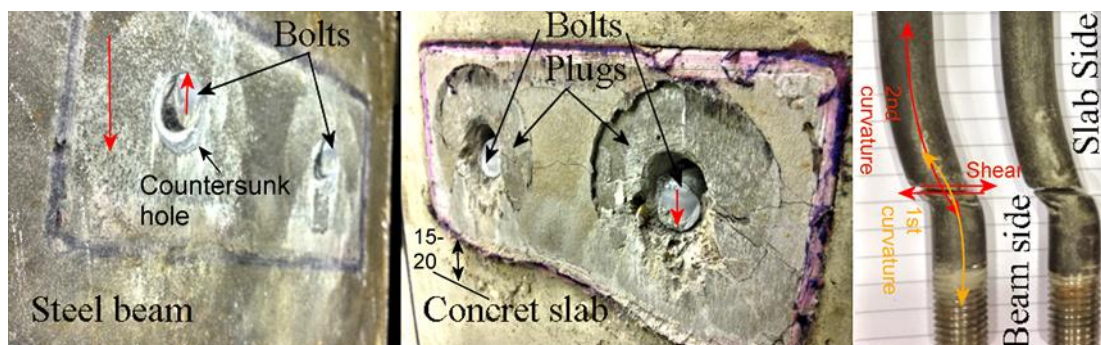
Failed bolts in steel beam, concrete slab, and separately
